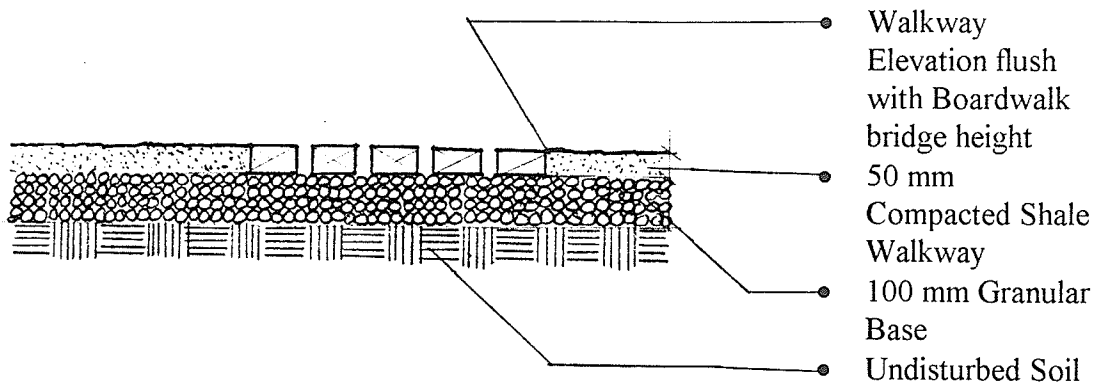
SECTIONAL DETAIL OF WALKWAY ( not to scale)
